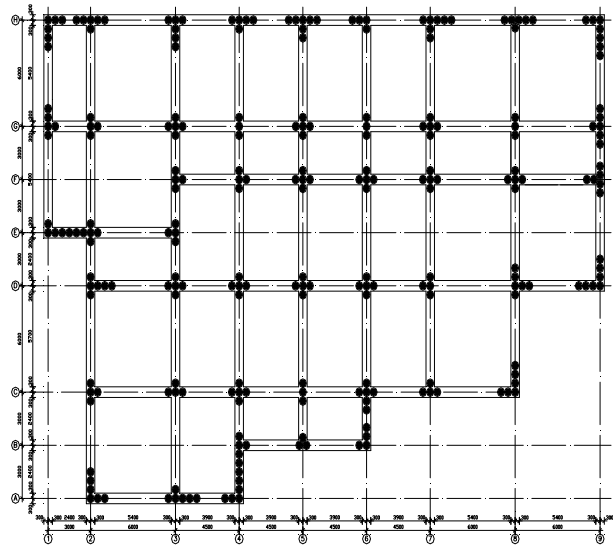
Plan of location of seismic isolation rubber bearings at the mark of -0.90 in the 15-story apartment building “Avan”
